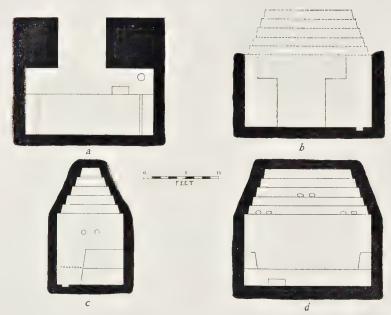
Structure R: details of northern room of western range. a, plan; b, western wall; c, northern end; d, eastern wall.
